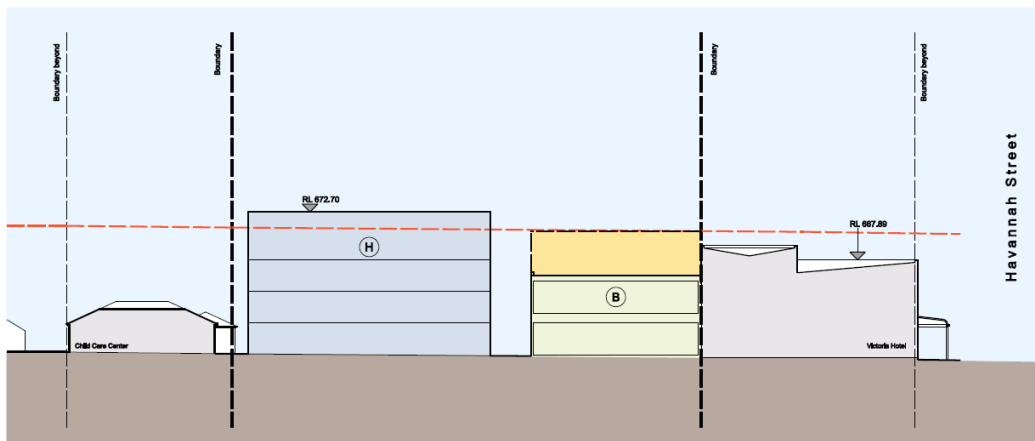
Cross section indicating potential floor space that could be achieved in yellow (Source: Karl Walls Design)
